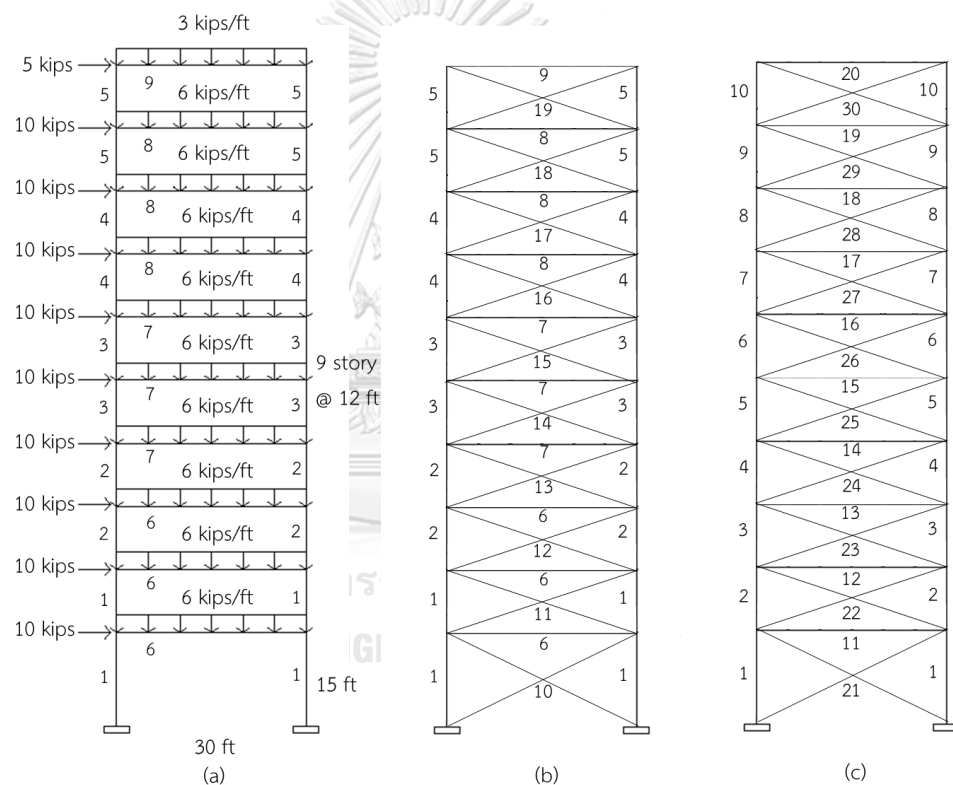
Layout and load of one-bay, ten-stories frame (a) Unbraced frame, (b) Braced frame with original grouping (c) Braced frame with new grouping
